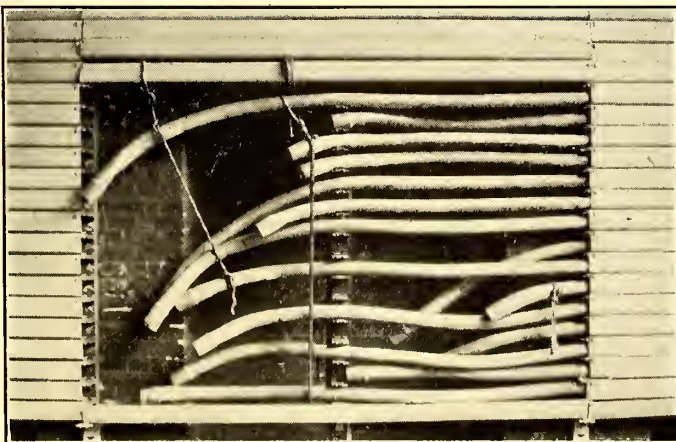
HIGH-TENSION CABLES IN TROUGHING BEFORE JOINTING, HIGH STREET TUNNEL
